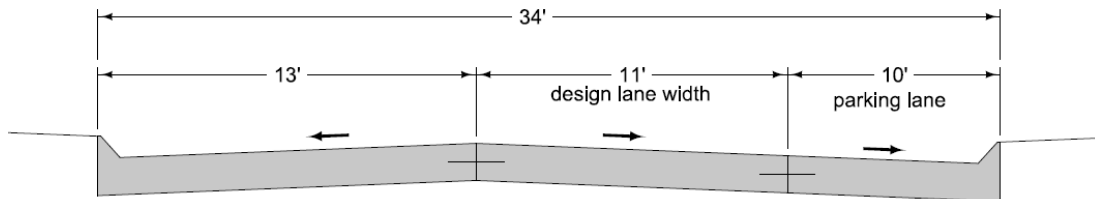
2-lane roadway with a parking lane and a standard paver width of 34 feet.
